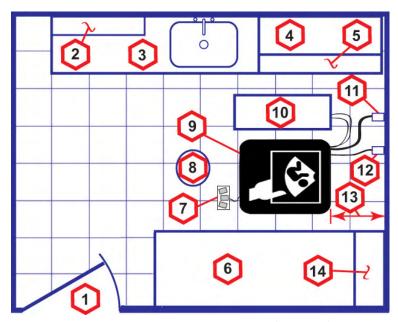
recommended Floor Plan 4.3 m x 5.2 m (14 by 17 foot)
